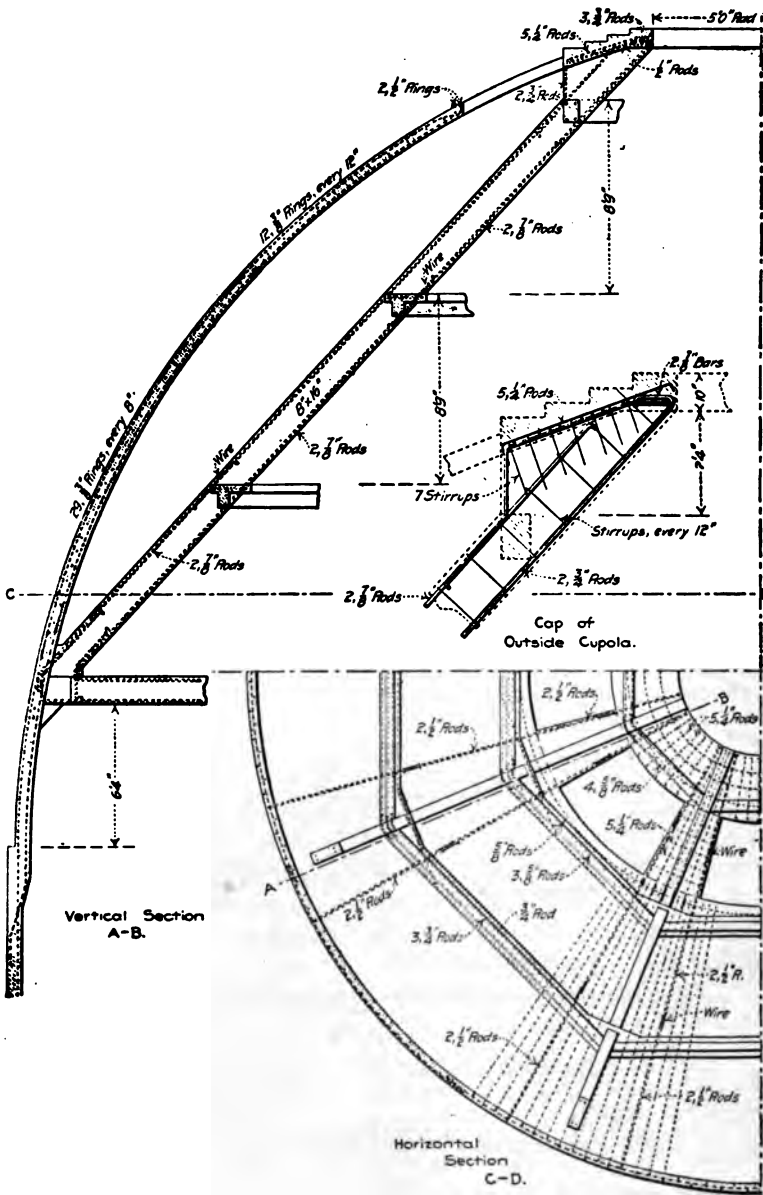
Details of Outer Dome, Naval Academy Chapel.
